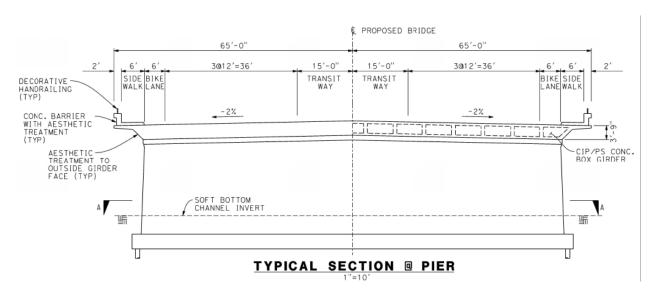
Typical Section of the Proposed Lincoln Boulevard Bridge over the Ballona Creek
